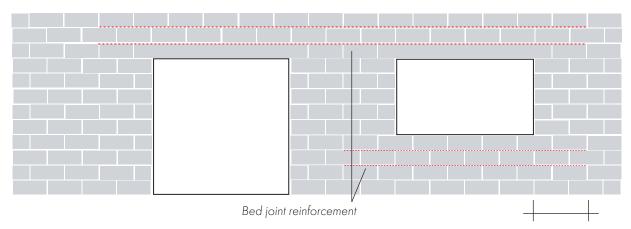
Use of bed joint reinforcement used to control movement at openings
